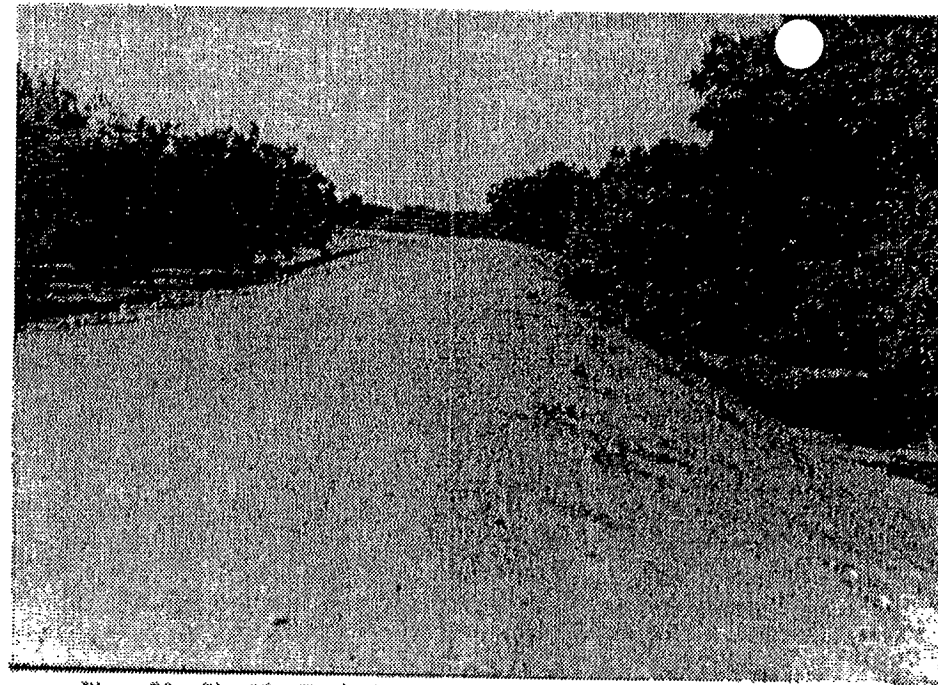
Site 19 - Typical levee along this site. Looking downstream from boring 2F-92-2. (May 21, 1992)
